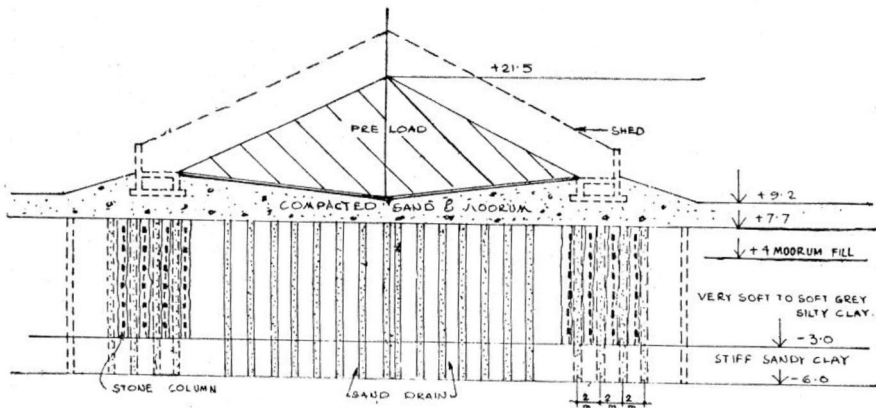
Stone columns and sand drainage arrangement for a typical silo.
